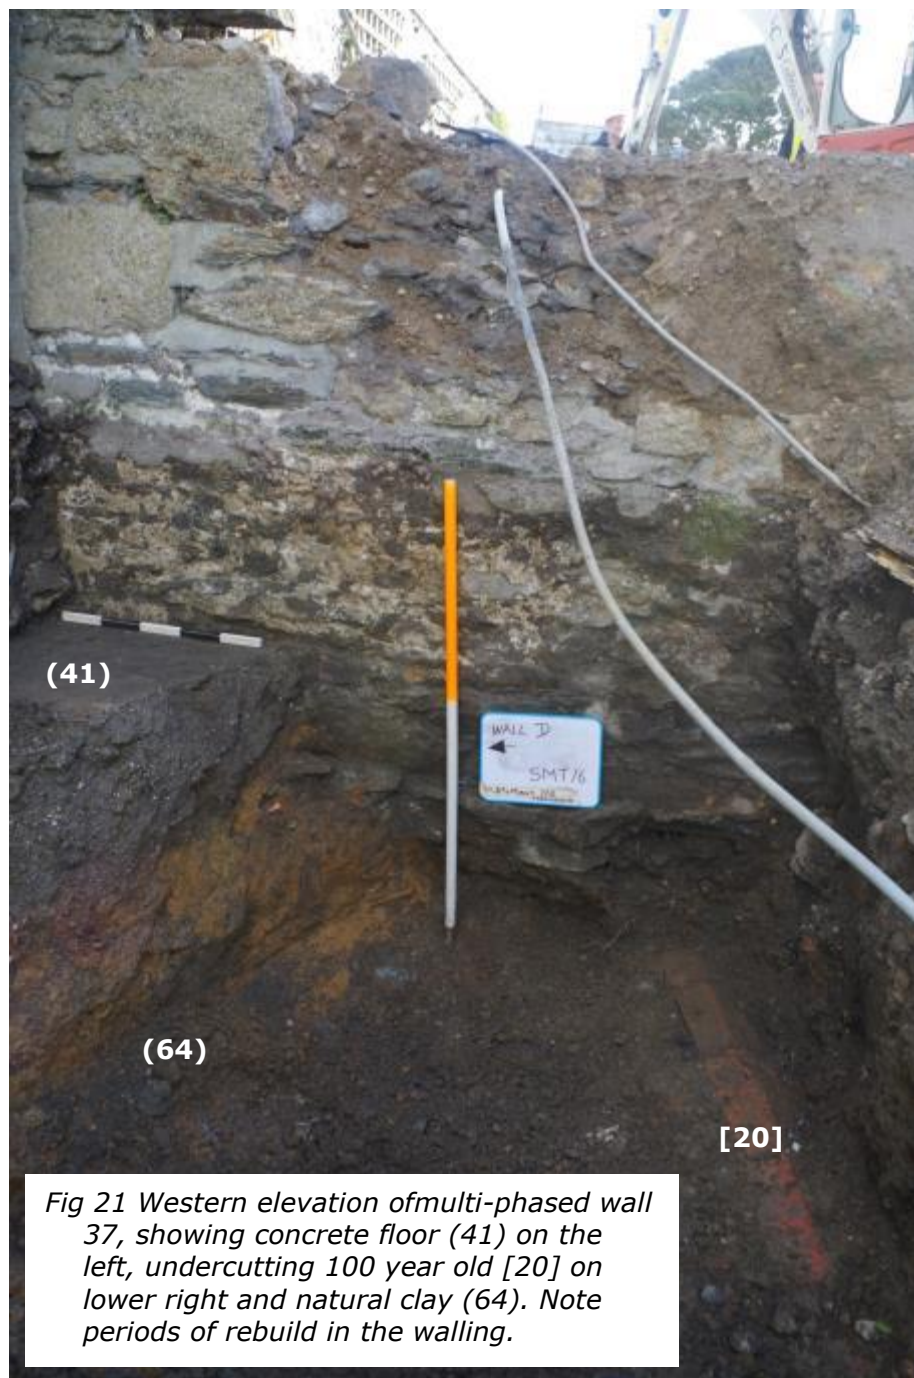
Western elevation of multi-phased wall 37, showing concrete floor (41) on the left, undercutting 100 year old [20] on lower right and natural clay (64). Note periods of rebuild in the walling.
